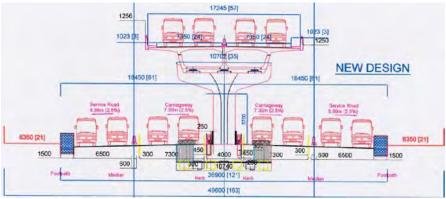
Cross-section of Bhulta Flyover plan
